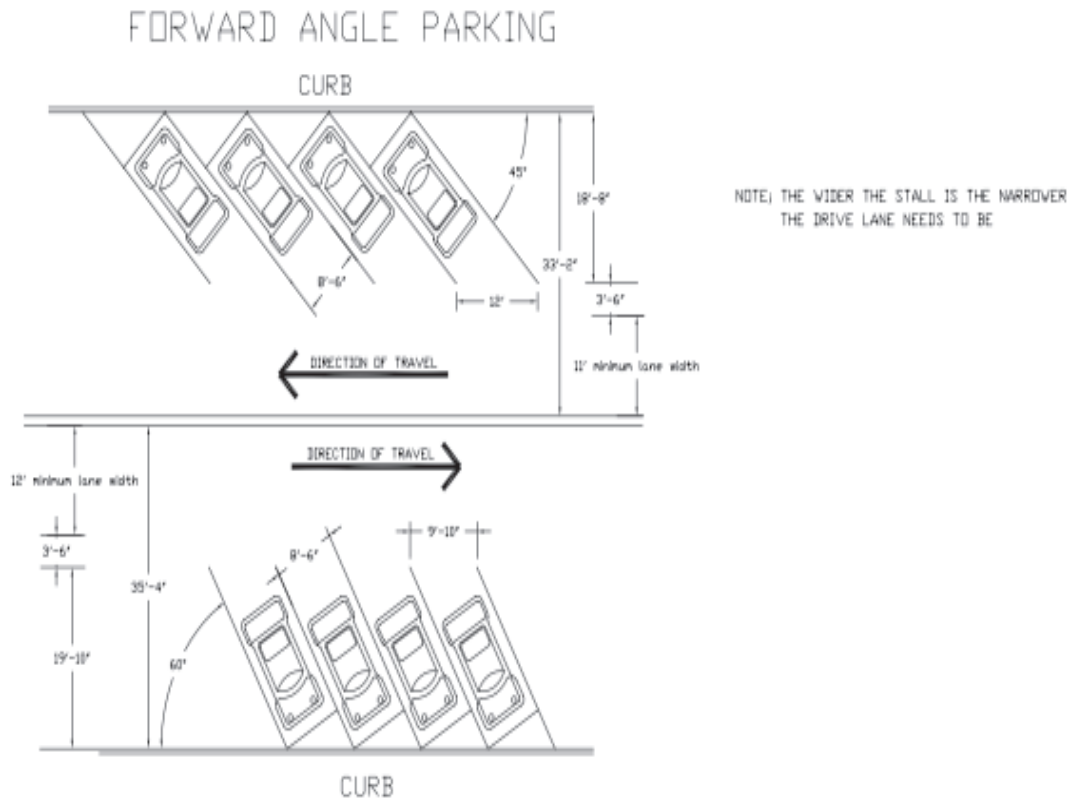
Example of 45° and 60° Angle Parking Pavement Marking Layout (KCMO Traffic Engineering and Operations Manual)
